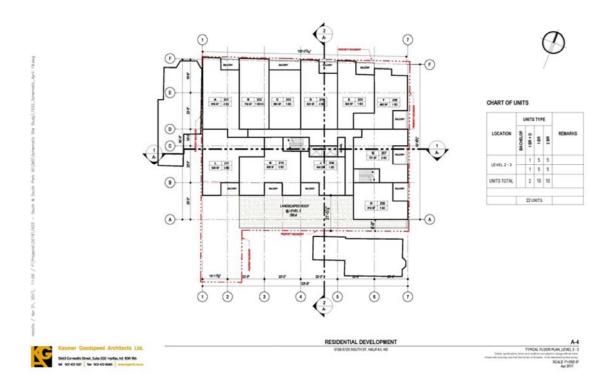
5706-5720 South Street Typical Floor Plan Level 4-8
